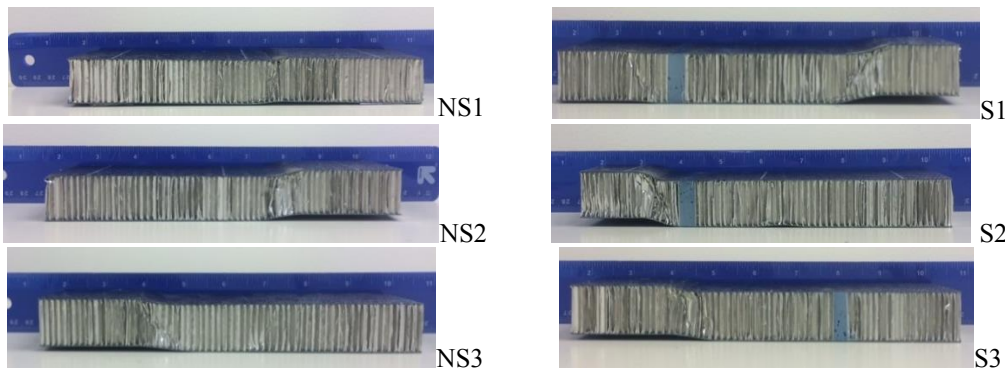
Photographs of the six beam specimens tested after failure showing failure modes.
